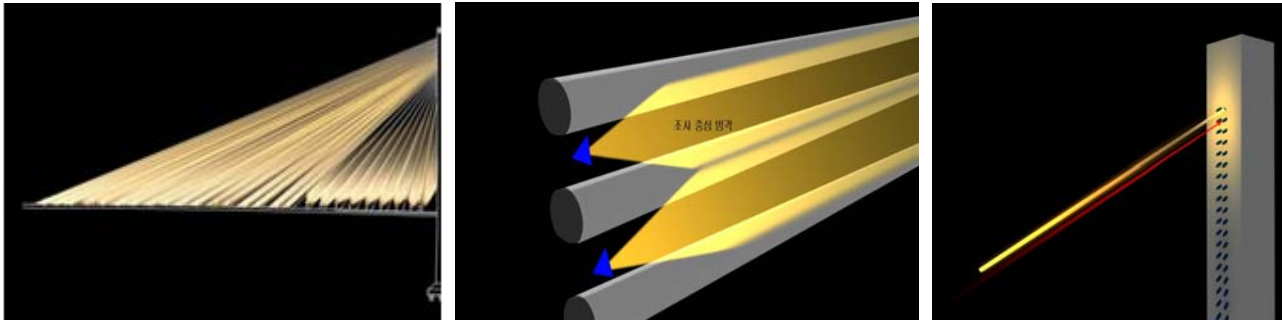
Flood Lighting Aiming at the Interior/Exterior of the Cables
